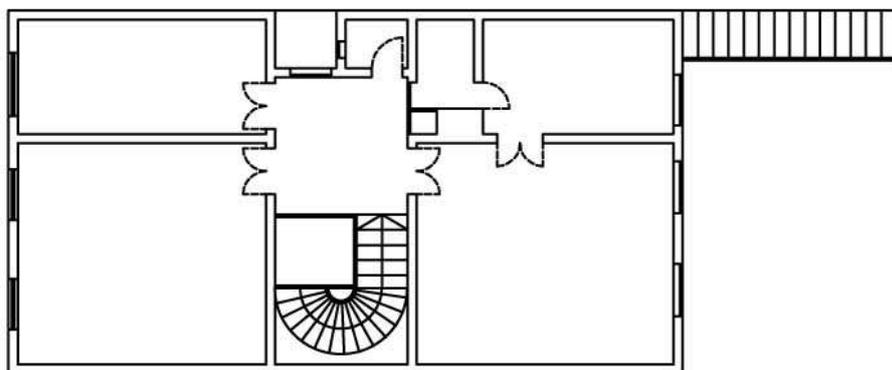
First floor plan of the house at 117 lot 6 parcel
